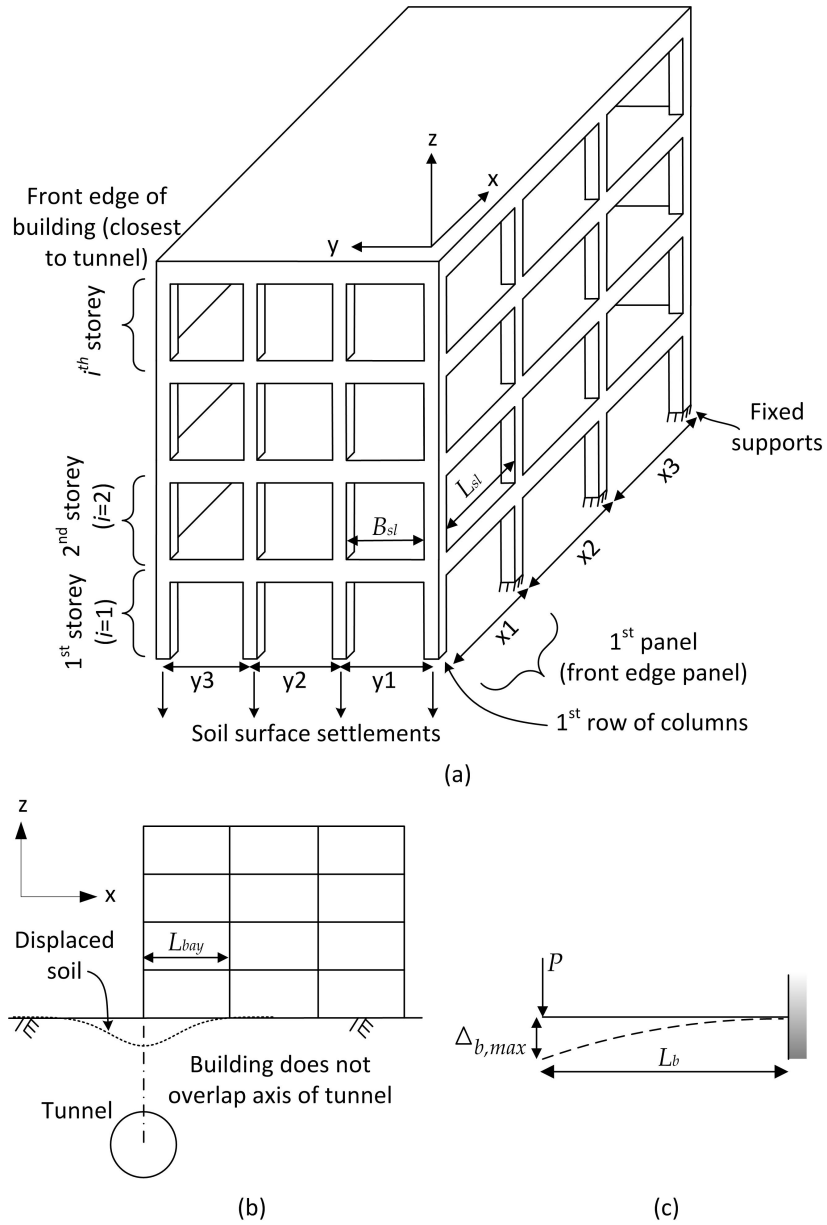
(a) Isometric view of framed building, (b) 2D view of building and tunnel, and (c) cantilever beam
